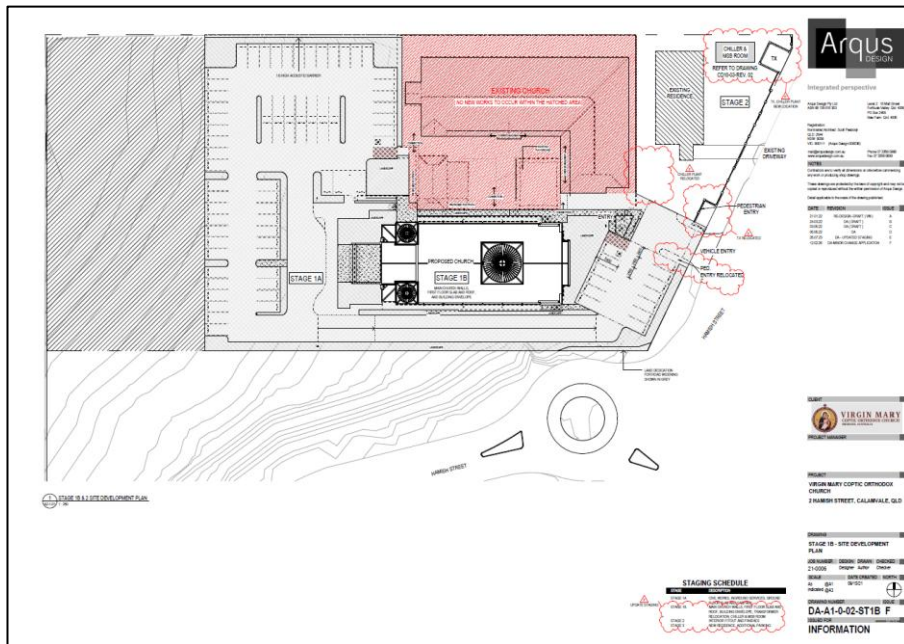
Proposed Stage 1B Plan Issue F – Arqus Design (12 February 2026)
